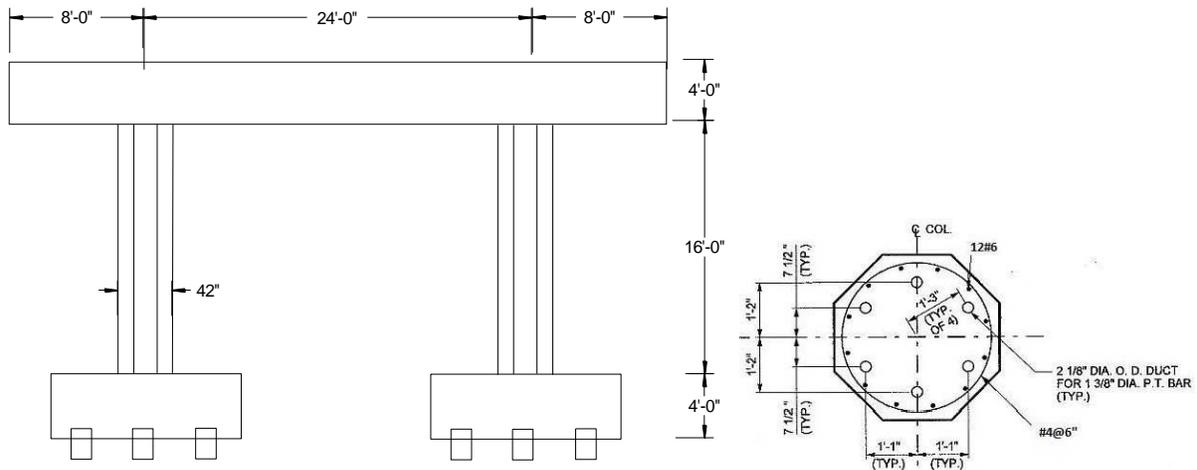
Typical Riverdale Bridge Post-tensioned Bent.
